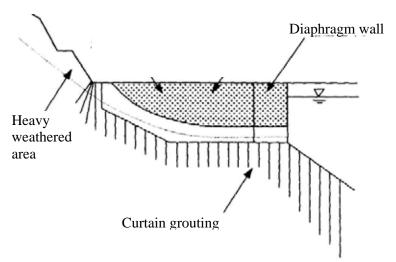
(1) Example of Diaphragm Concrete Wall
